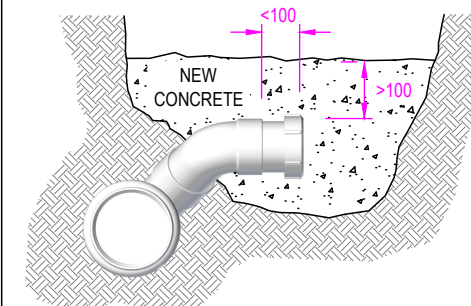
H: TYPE 1 or 4 CONNECTION CAP
